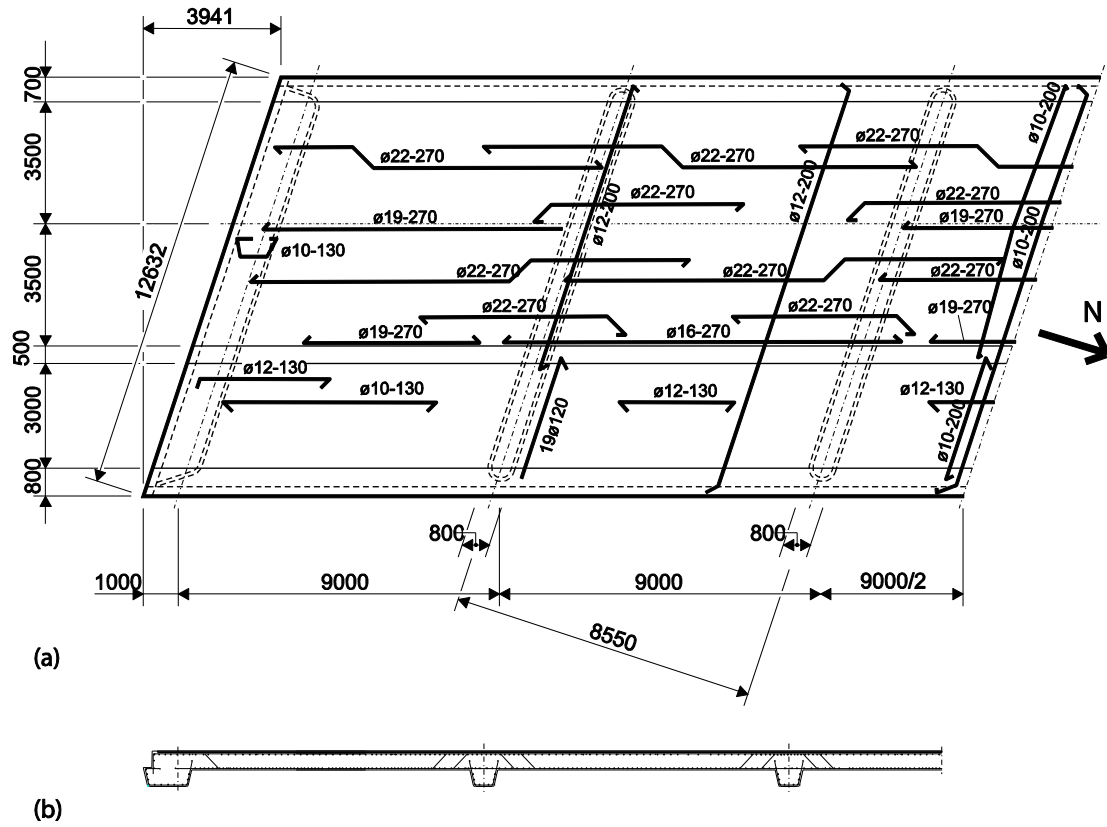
Reinforcement drawing of Ruytenschildt Bridge, showing spans 1, 2 and half of span 3: (a) Plan view; (b) cross-section. The structure is symmetric. Units: [mm].
